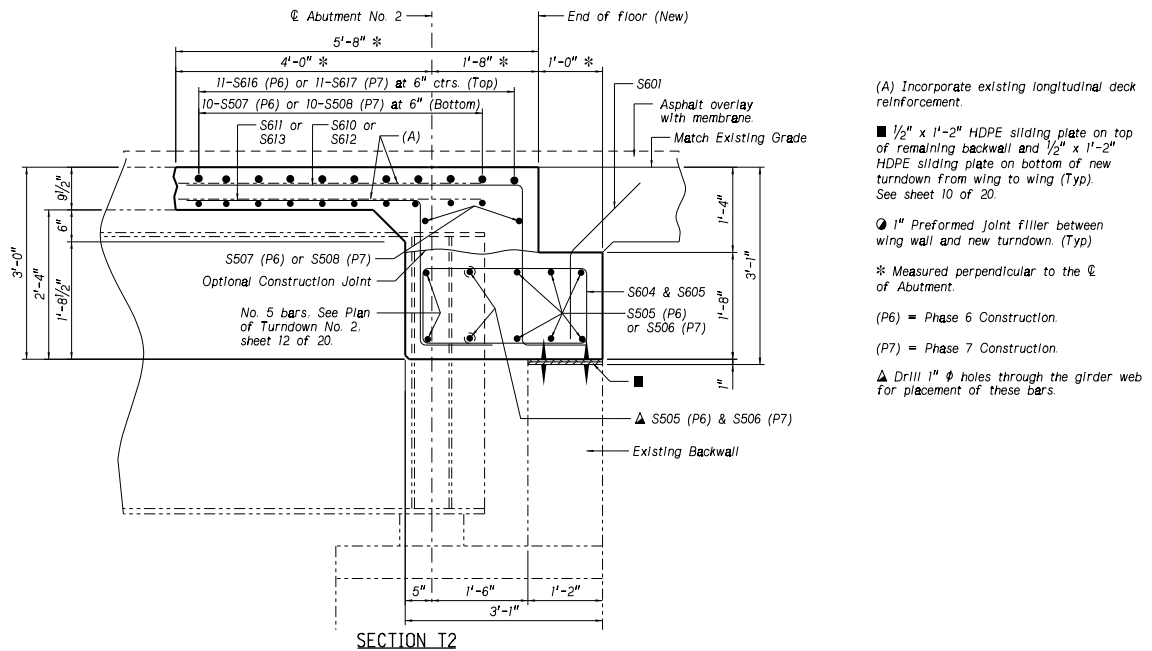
Partial Turndown with HDPE Sliding Plates
